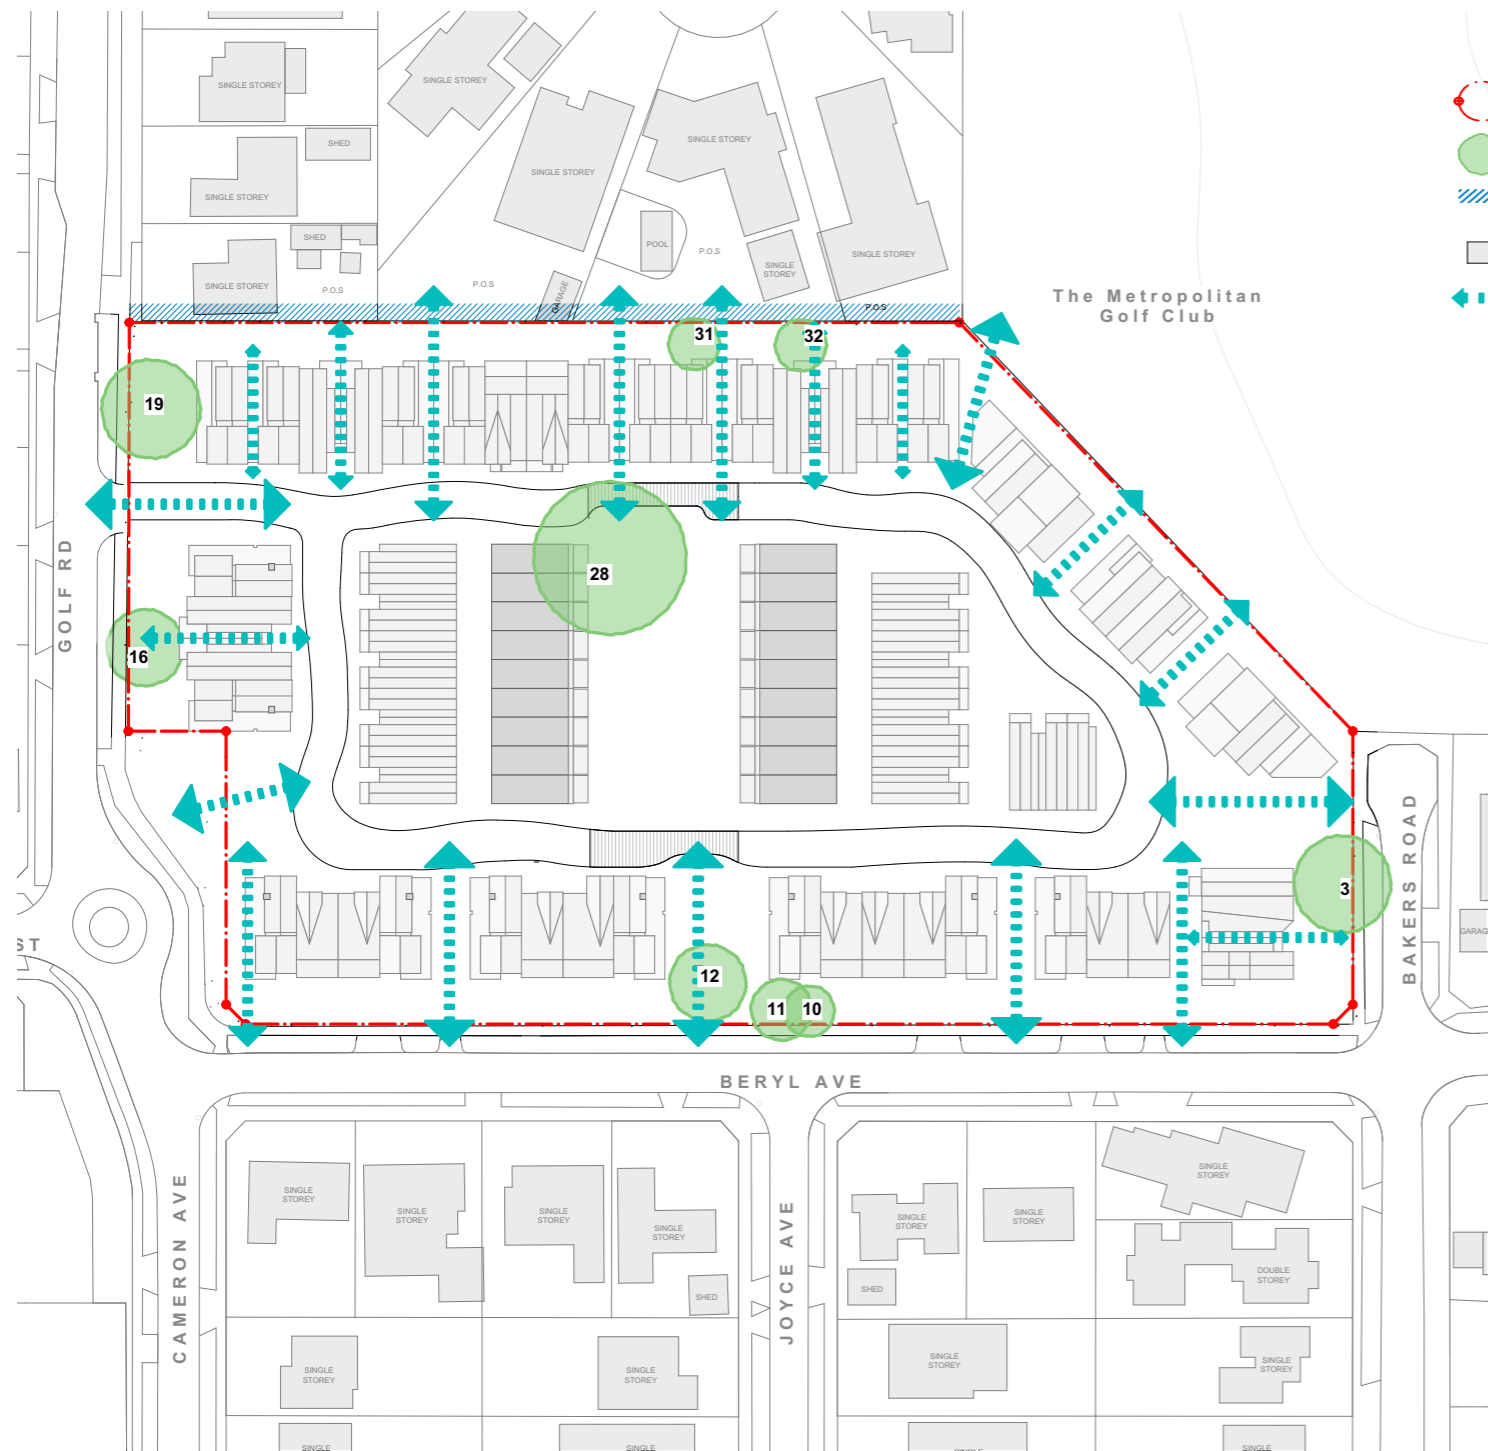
Urban Integration Plan (Source: Plus Architecture)
